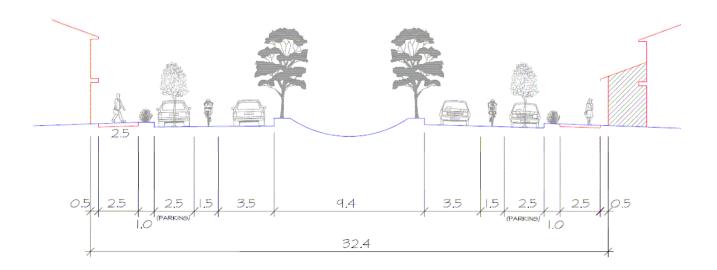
Integrator B, Option 6 – Typical Cross-section with Drainage Swale in the Middle – 32.4m Reserves with on-street Parking
